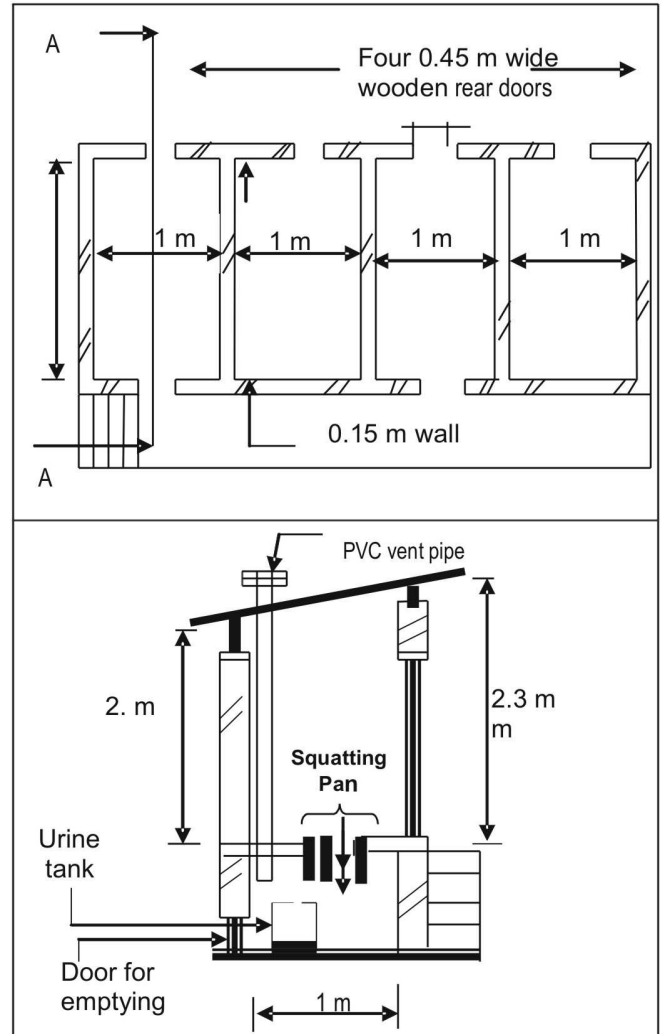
Floor Plan and cross section of the double Vaults UDDT.
